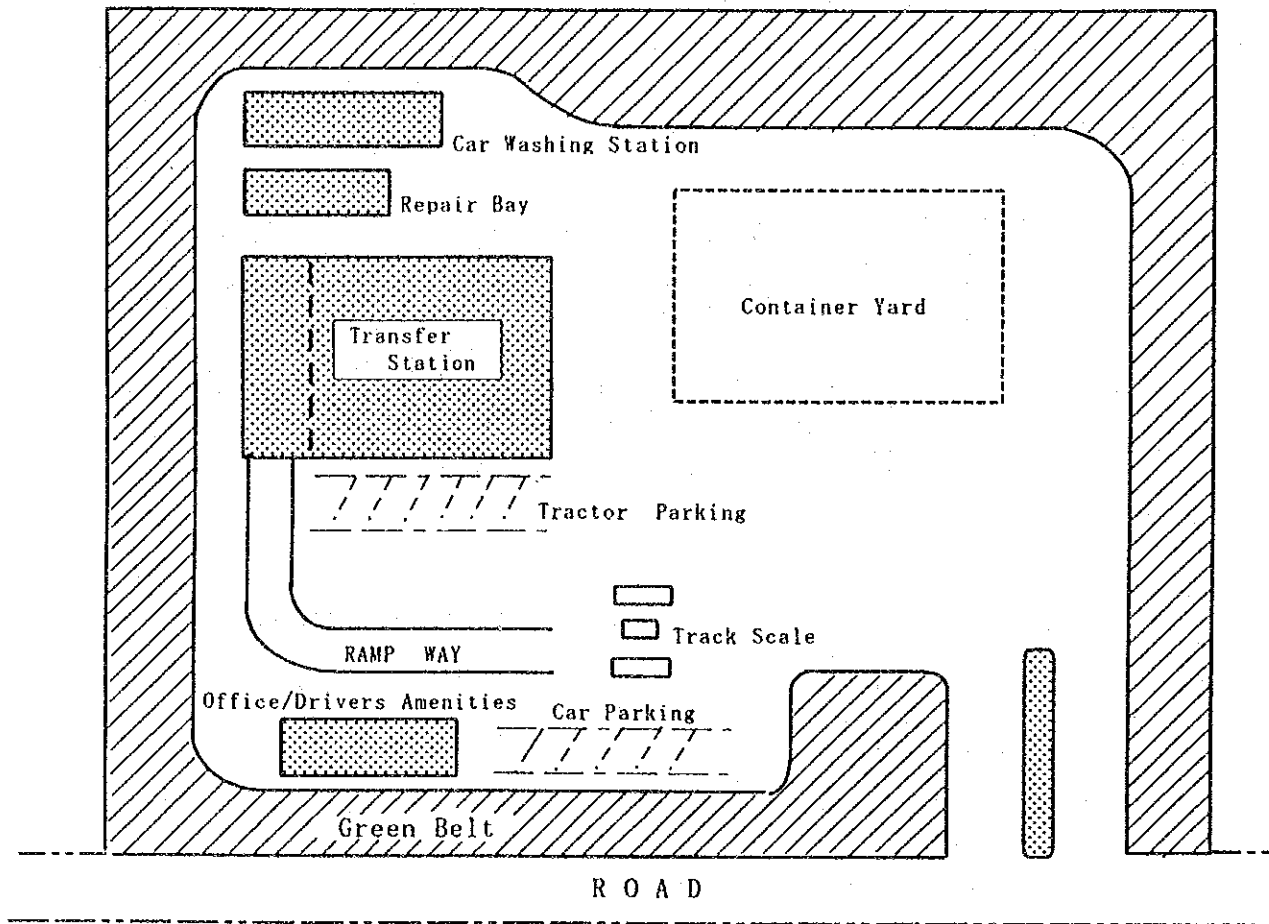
Plan of Transfer Station (with Compaction Equipment)
